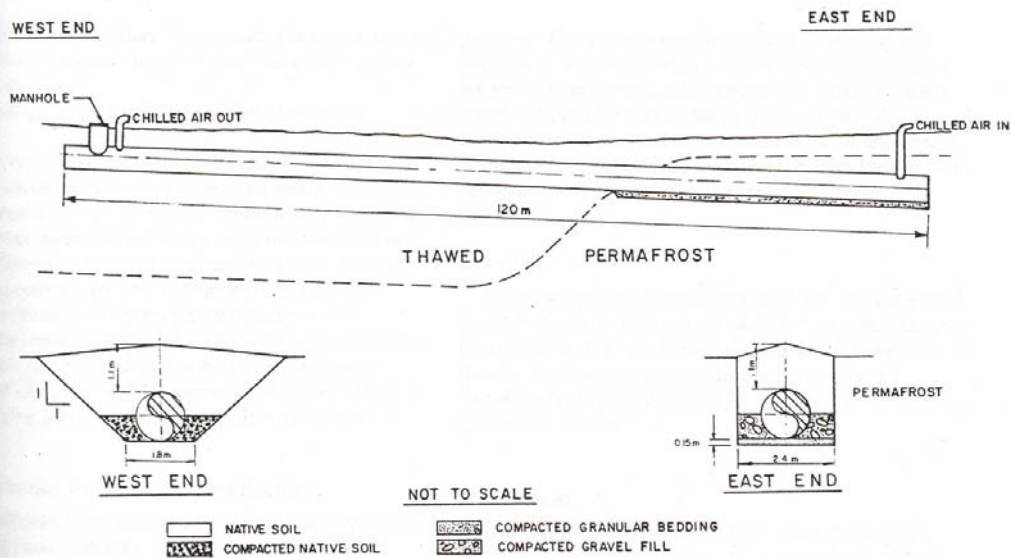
Interface test pipe, Fairbanks frost heave test facility
